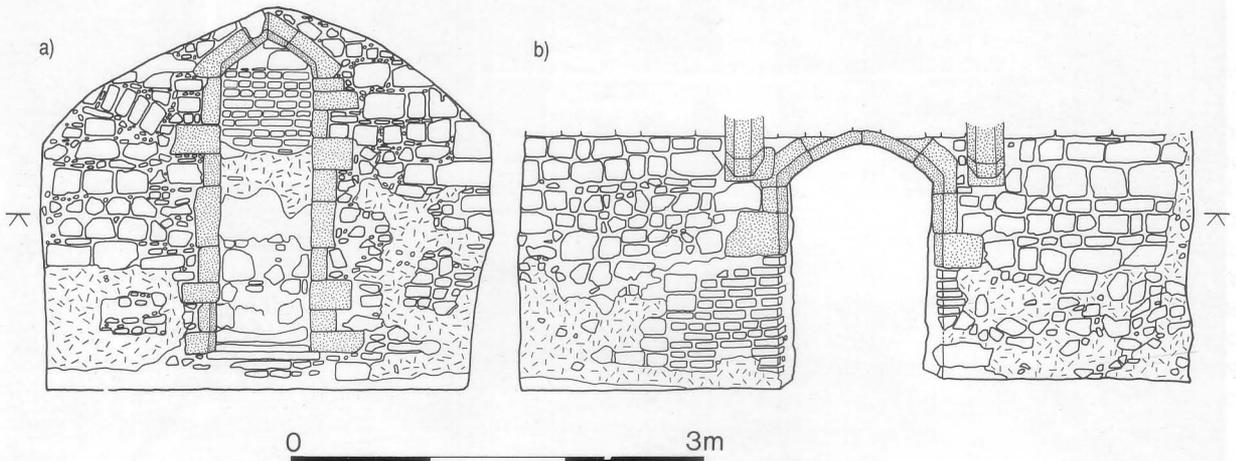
internal elevations of crypt below Lady Chapel: Greensand blocks stippled. A) north face with blocked medieval door; B) east face with medieval window now converted into modern door;
